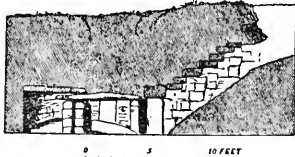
Section of Pict's House, Pierowall, Orkney. From *Archæologia*, vol. xxiv. pl. 17.
